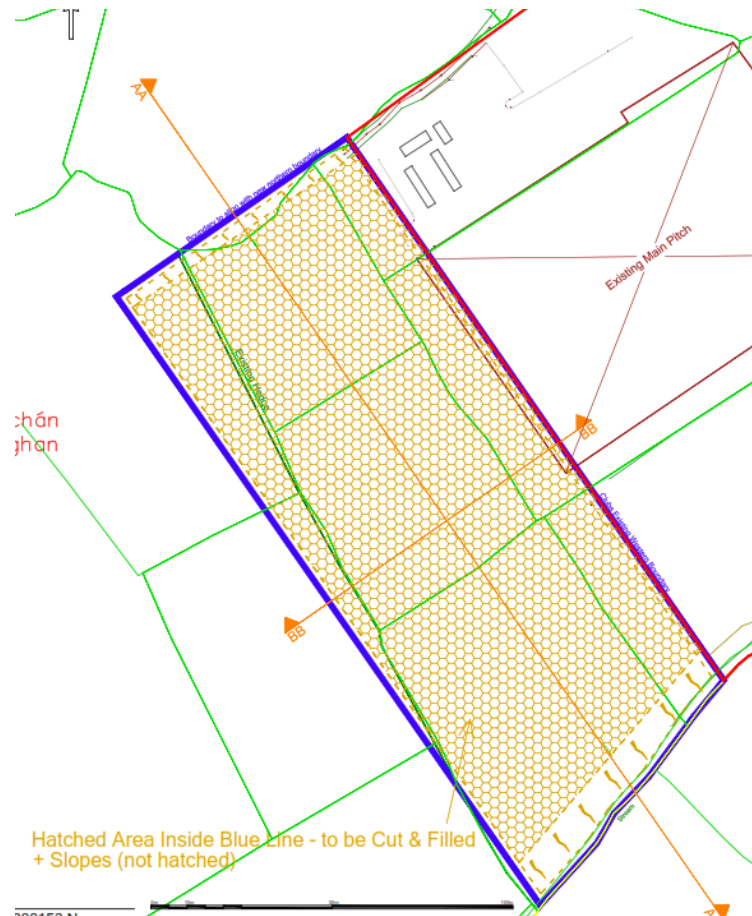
Extent of land initially proposed to be developed as new training pitch for Carrick-on-Shannon Rugby Club
